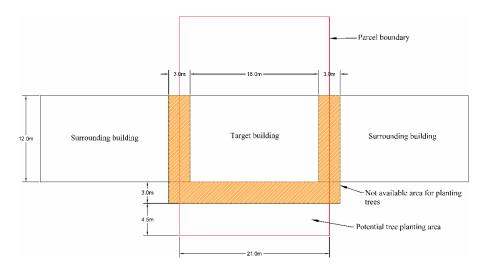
Potential Tree Placement Area in the Study Site (Plan View)
